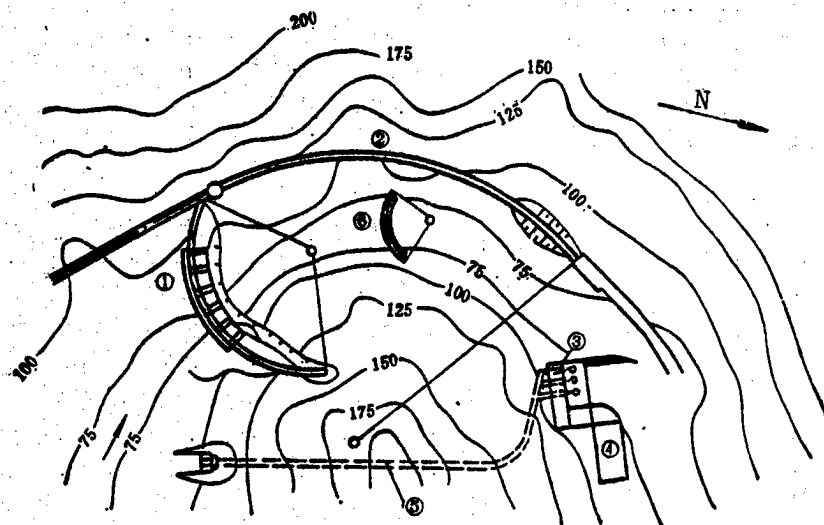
Schematic of Ouyanghai Reservoir Structural Layout
